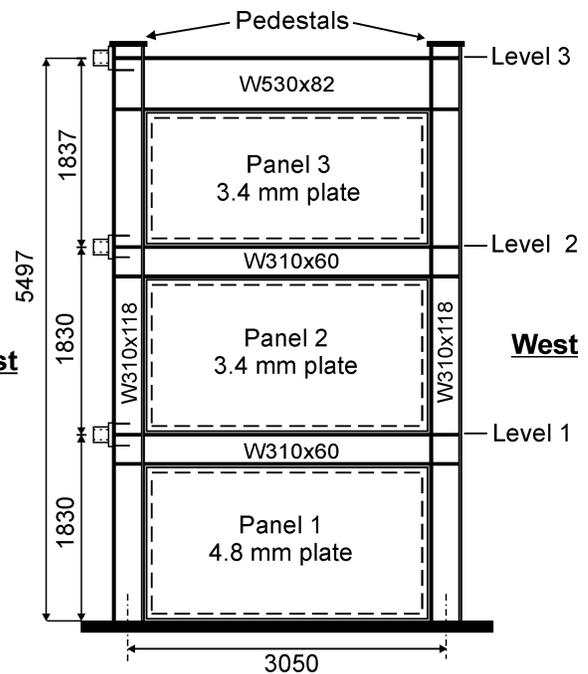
Schematic of a 3-storey steel plate shear wall
